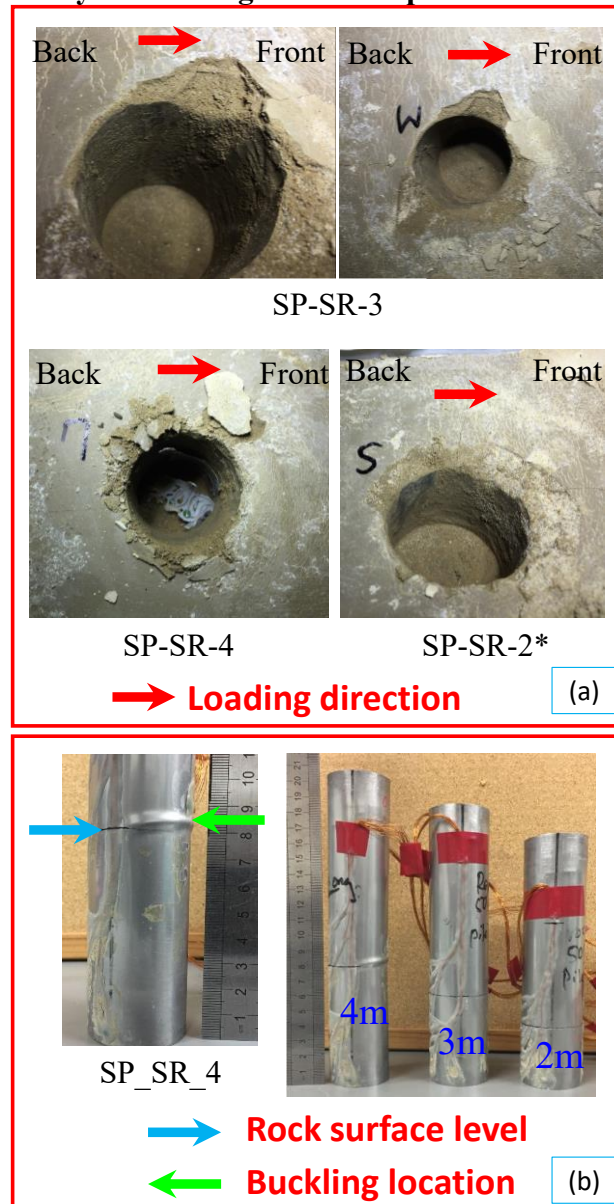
Observed ground failures and deformation of piles embedded in soft rock (Model-4)
